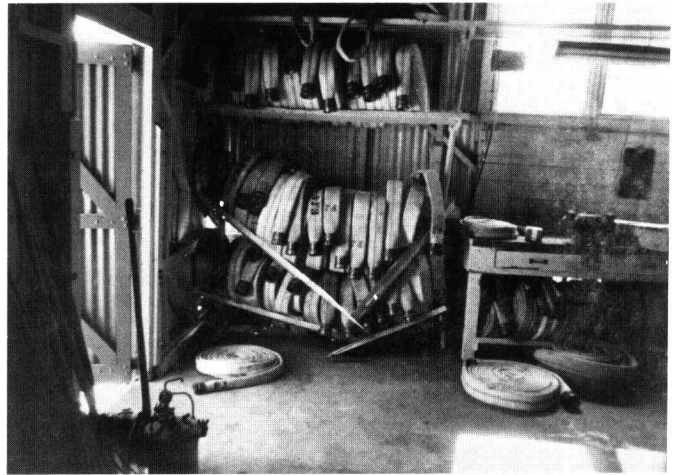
Damage to garage interior. Rubber marks on door frame appear to have been made by rear tire of truck.
